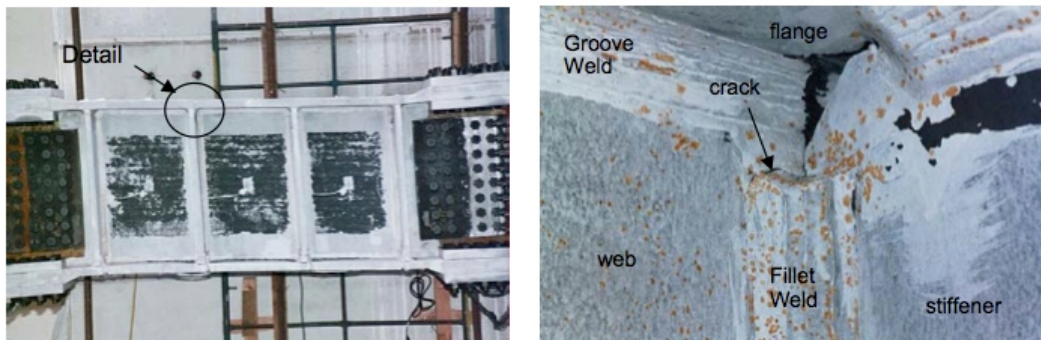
Type 1 (transverse) link deformation and detail on weld crack after a 345mm displacement [14].
